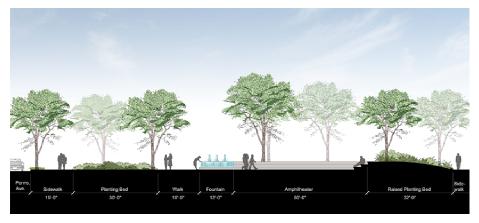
Landscape Design Concept Section Existing (Improved)
